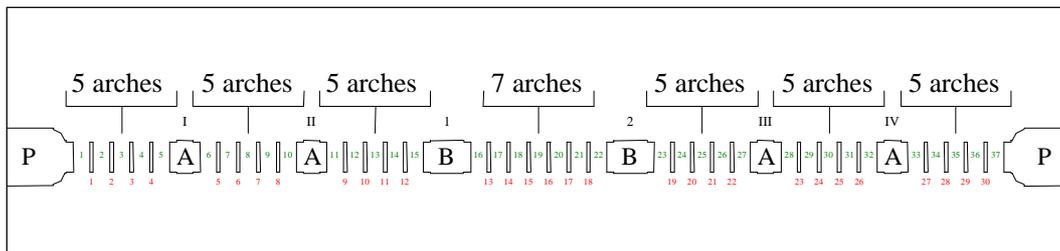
The modulus “stadio” in trans-lagoon Venice masonry arch bridge.
